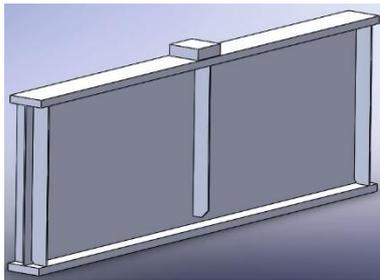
Plate Girder with one stiffener at ea. side of point of load application
